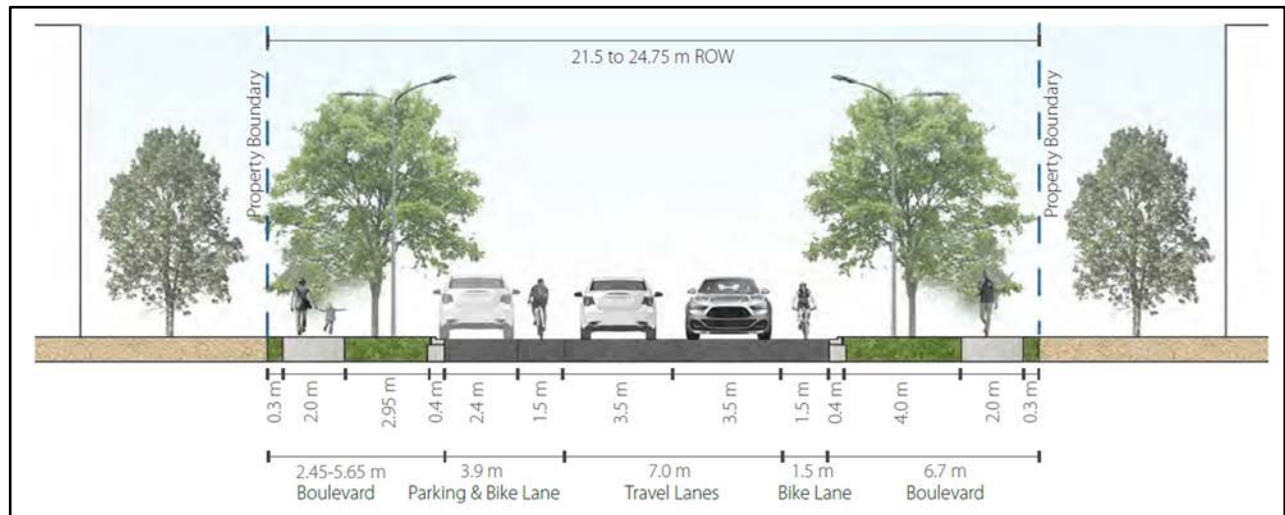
21.5m ROW Collector Road (Typical Cross-Section)
